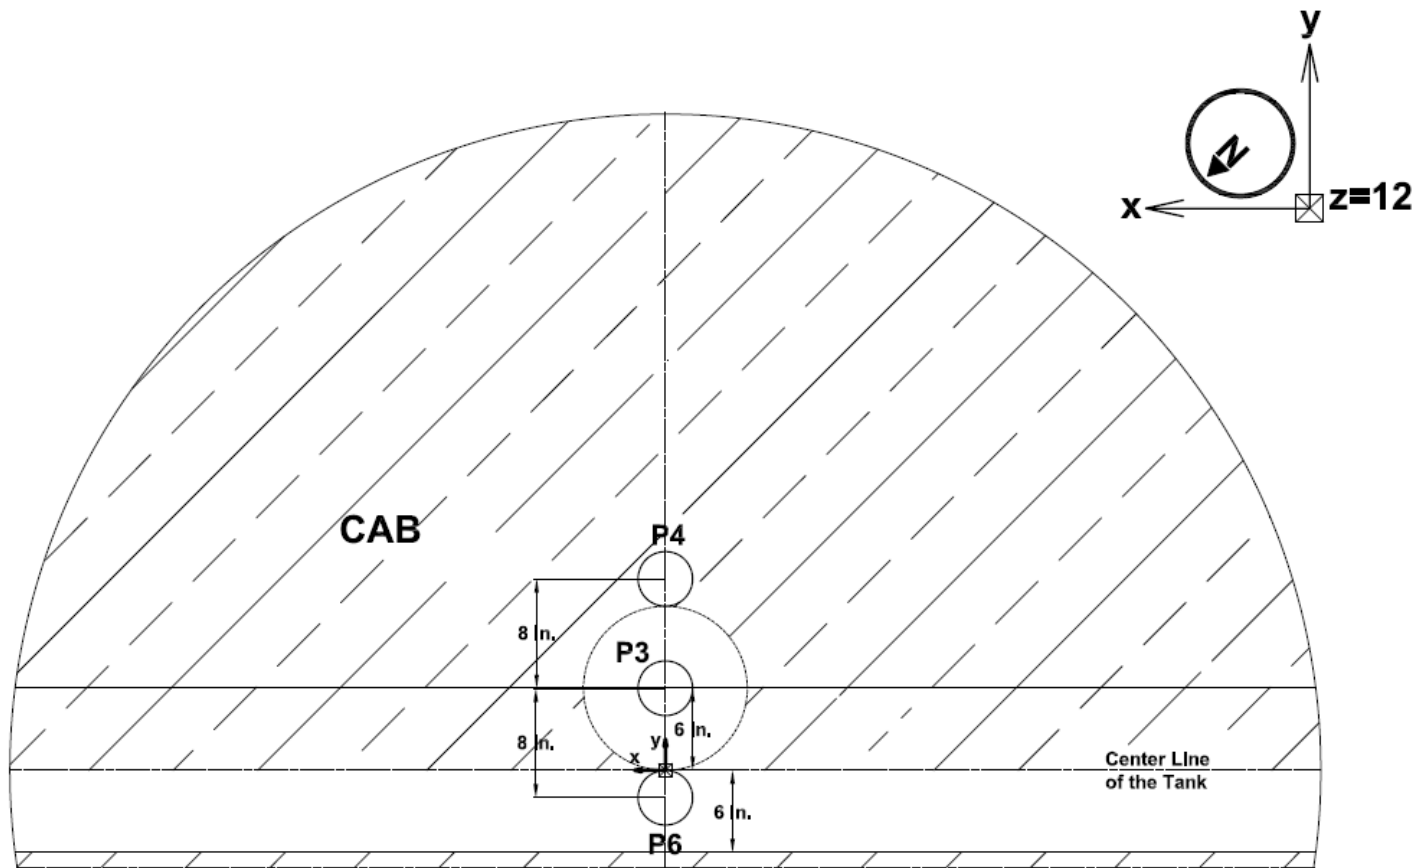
Instrumentation plan for experiment No. 9—Plan view, $Z=12$ inches
